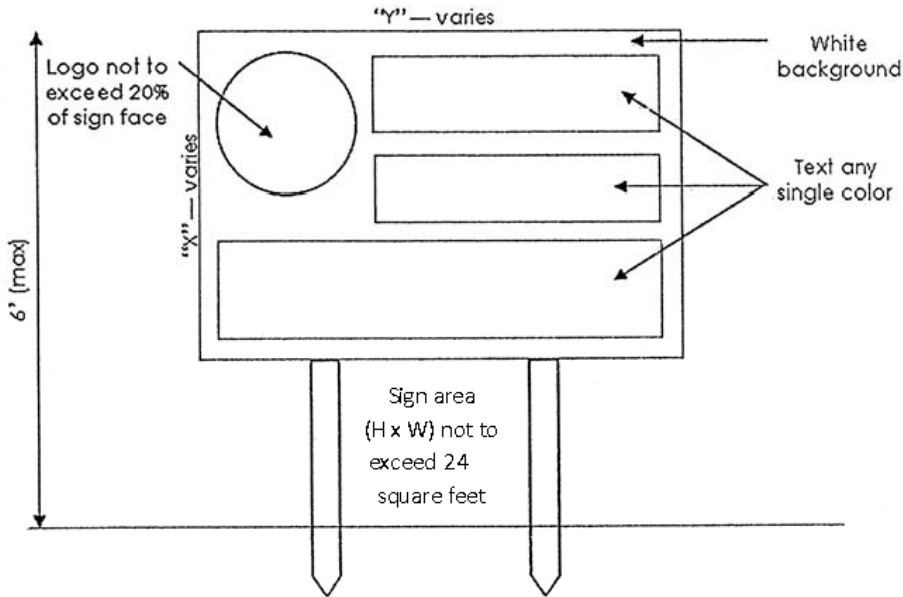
Signs for properties with building permit or site development plan in non-residential districts
